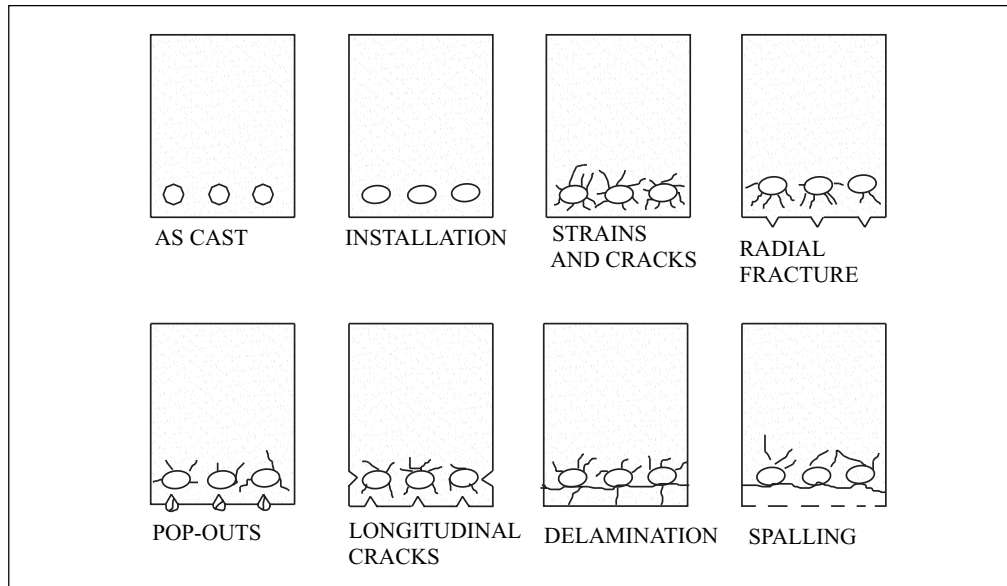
Typical symptom of corrosion in a reinforced concrete Beam
